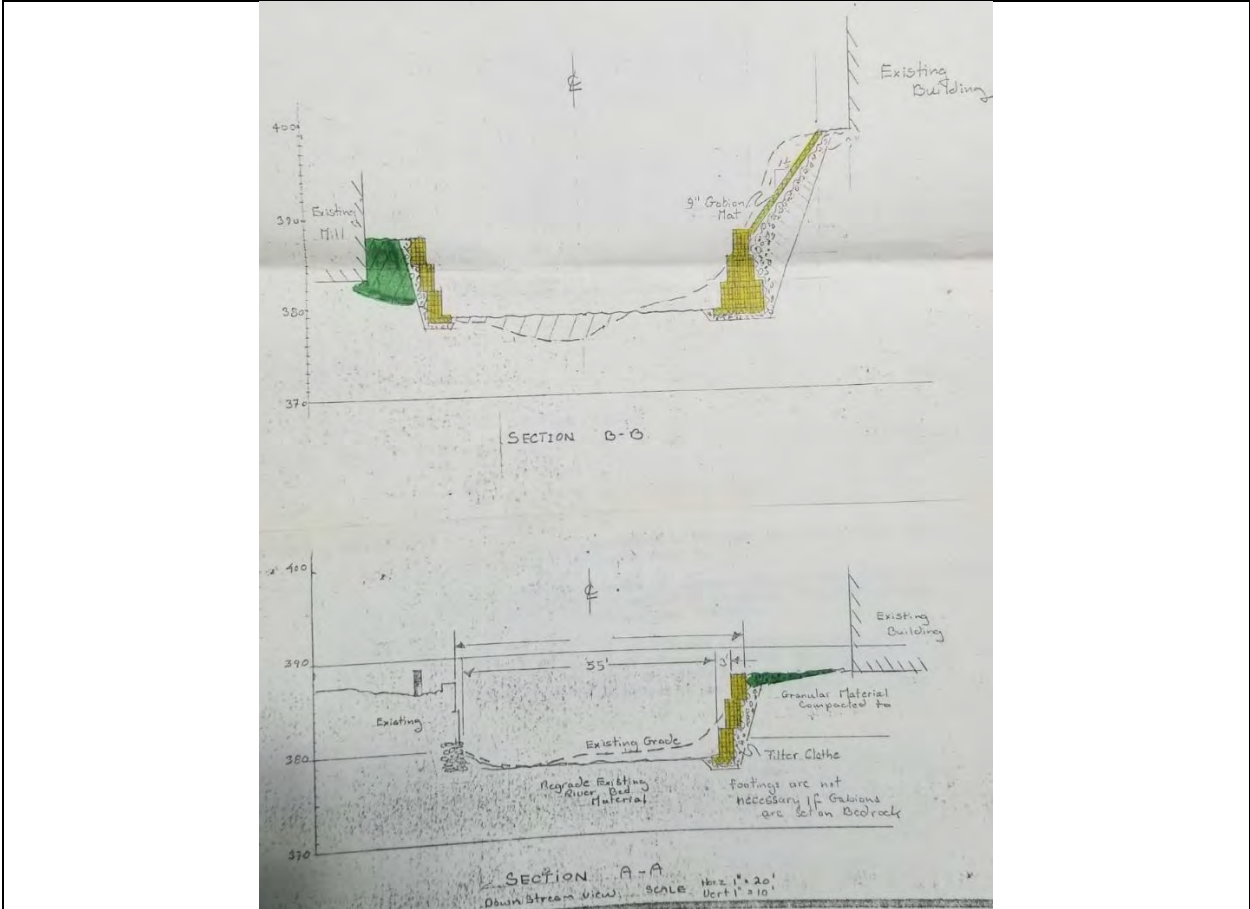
Cross-Section Drawings of Erosion Control Works in Stirling
